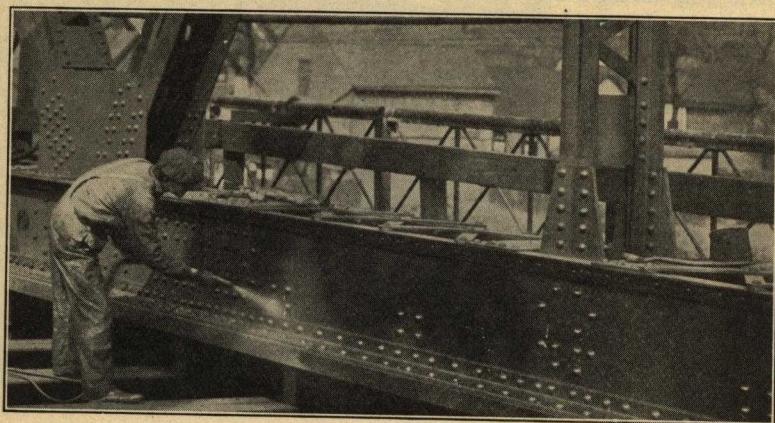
Painting with compressed air, Spray Engineering Co., Boston, Mass.
